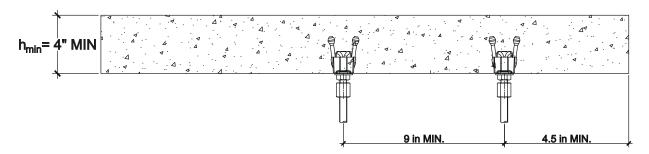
shows Spider Wood Form Insert in 4 inch concrete slab.
